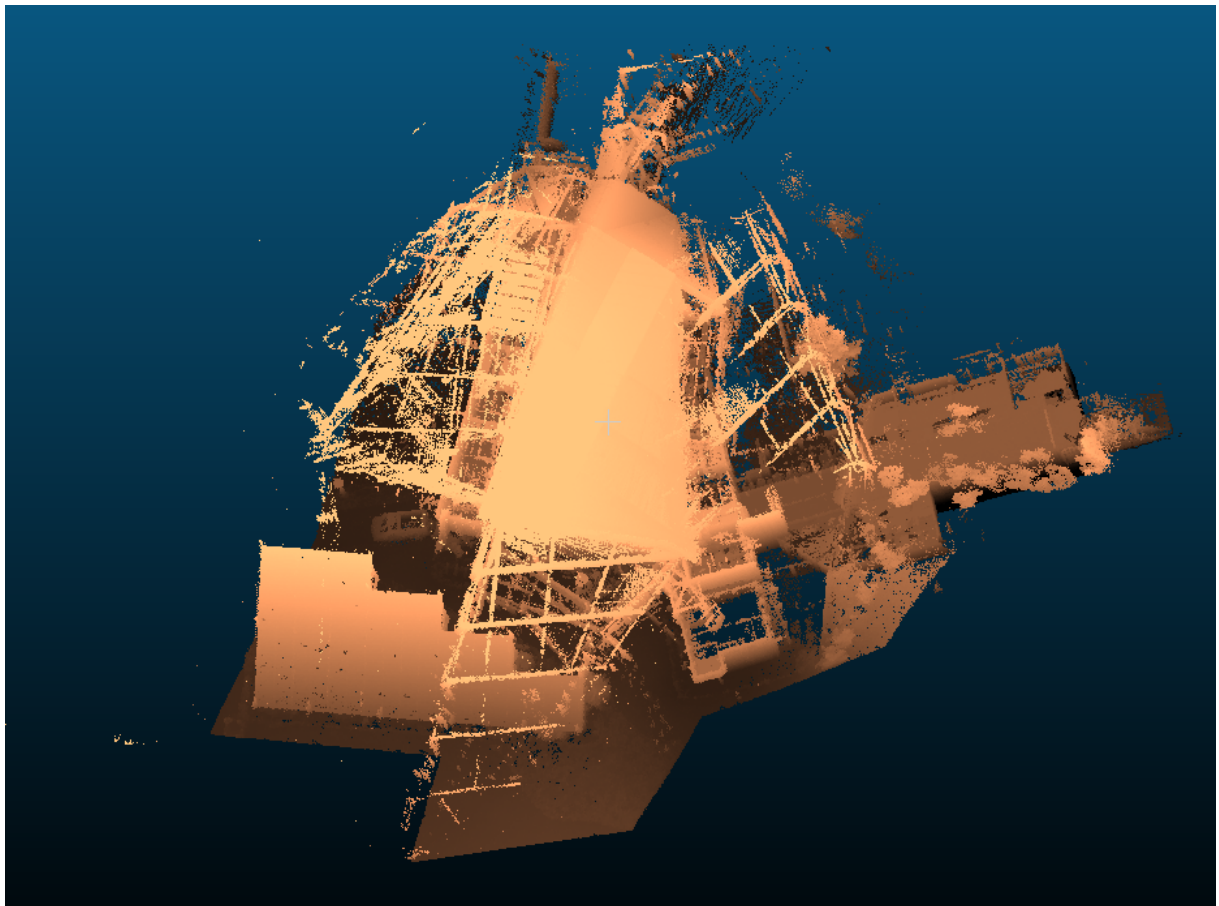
The point cloud for Hysolar building outdoors (North direction)
